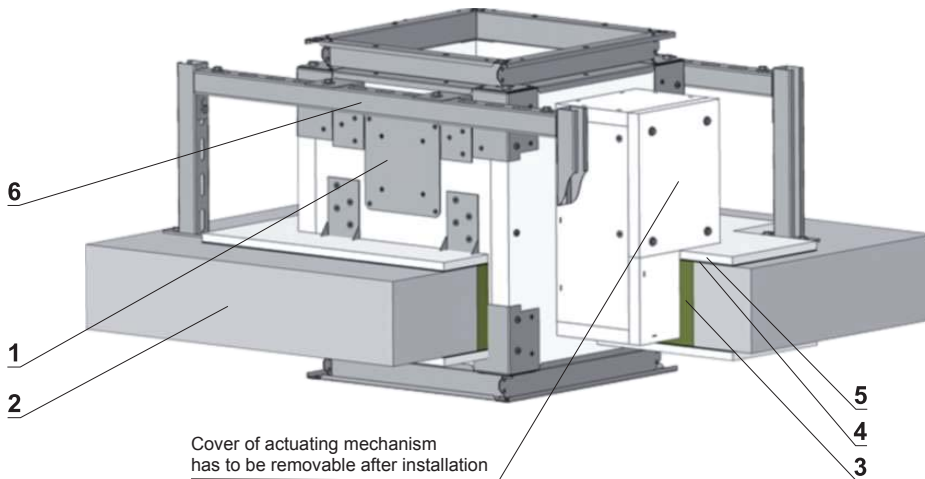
Example of installation in solid ceiling construction of fire compartment - actuating mechanism below
